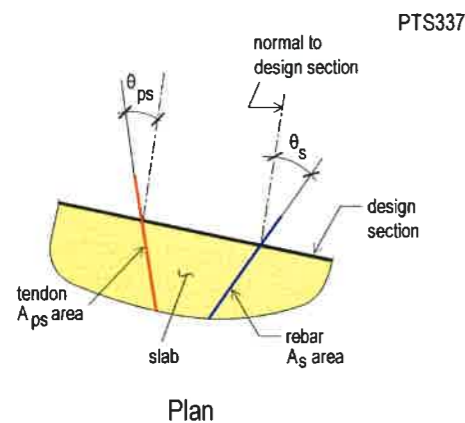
Plan; Design Section and Intersecting Reinforcement
